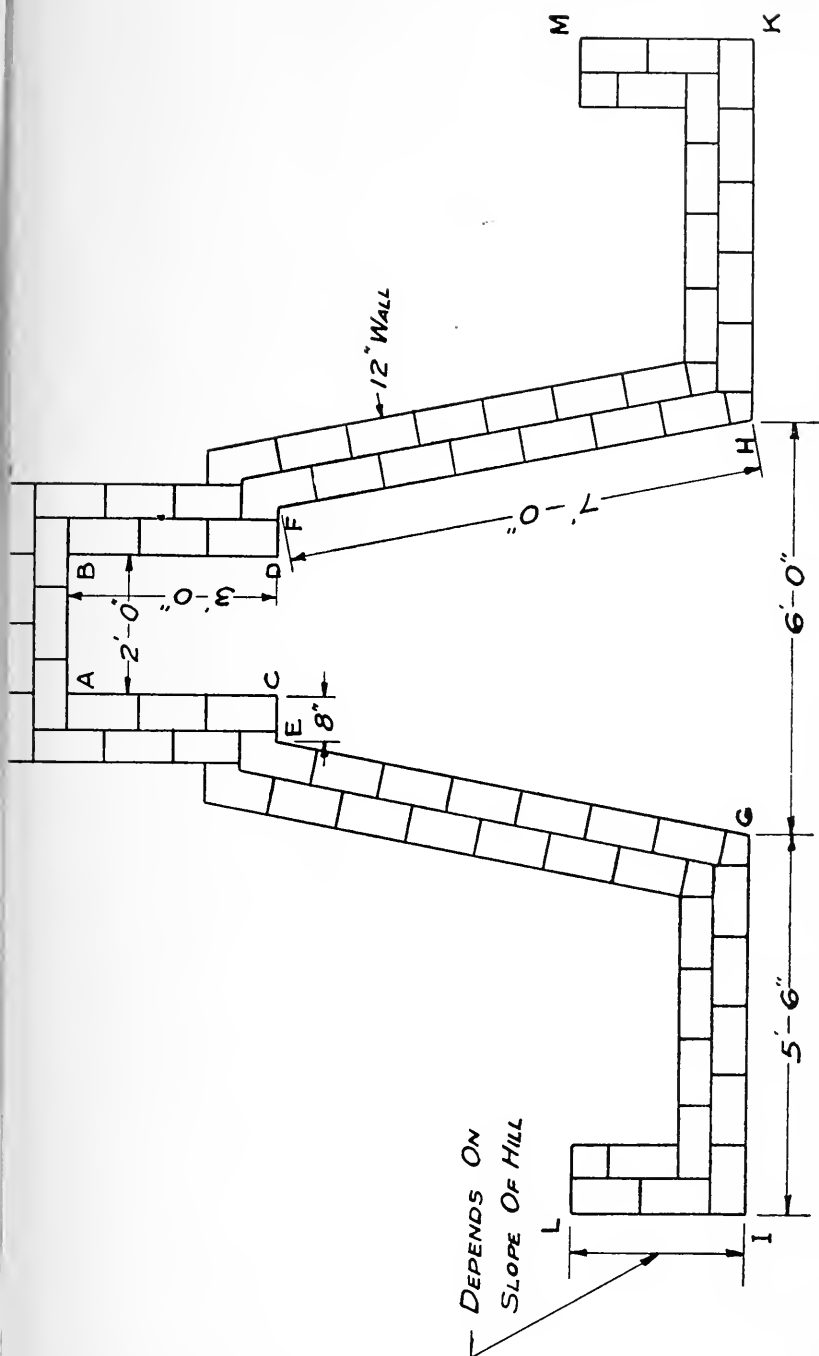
Foundation Wall of Kiln Constructed in and About Excavation Shown in Figure 13.
